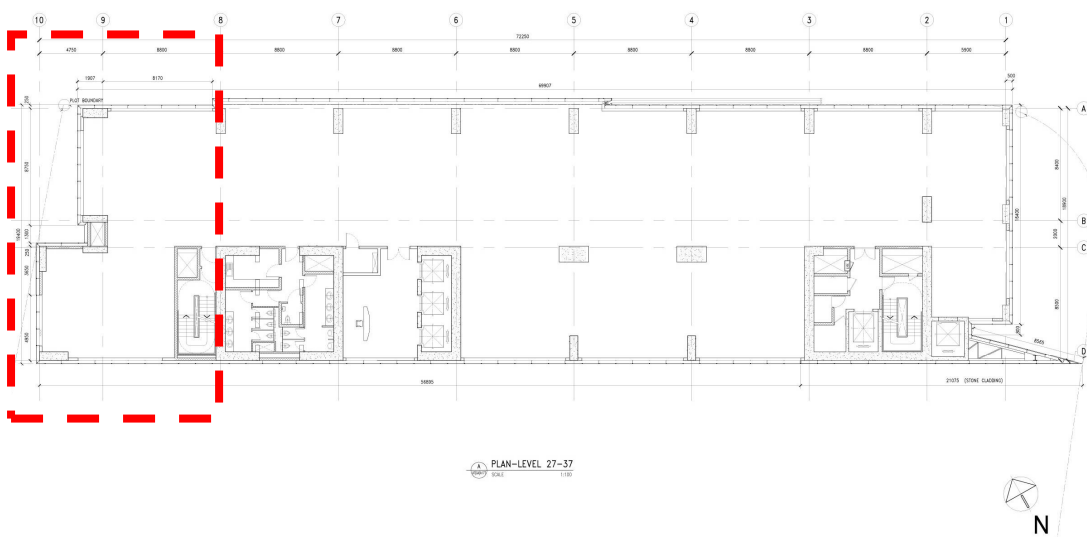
Monarch Office plan typical office plan, Personal Archive, 2007
